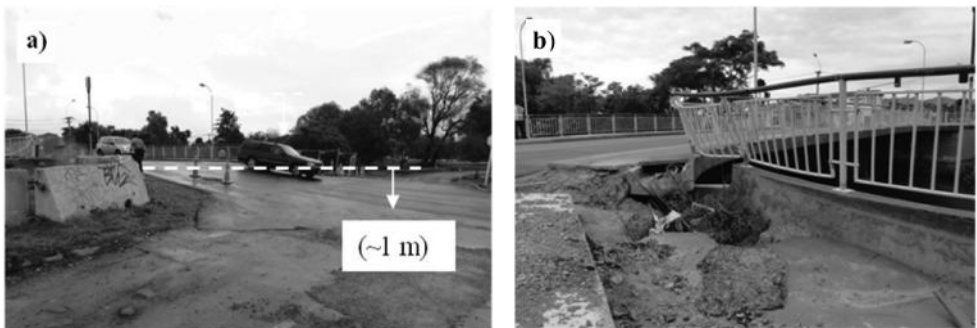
Dallington (Gayhurst) Bridge: (a) subsidence of ~1m at the north approach (point-bar deposit) (b) failure of the north wing wall due to large differential movements between the adjacent river banks and the abutment wall.
